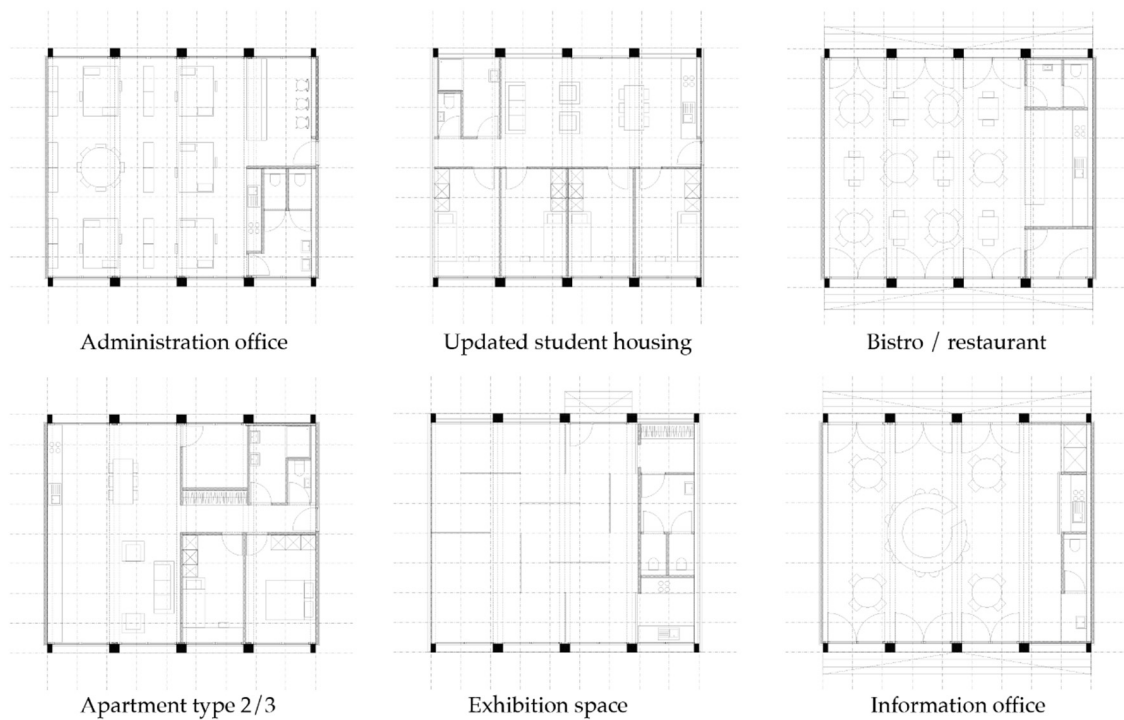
A series of scenarios shows potential future uses and corresponding plan layouts for the Circular Retrofit Lab project.
